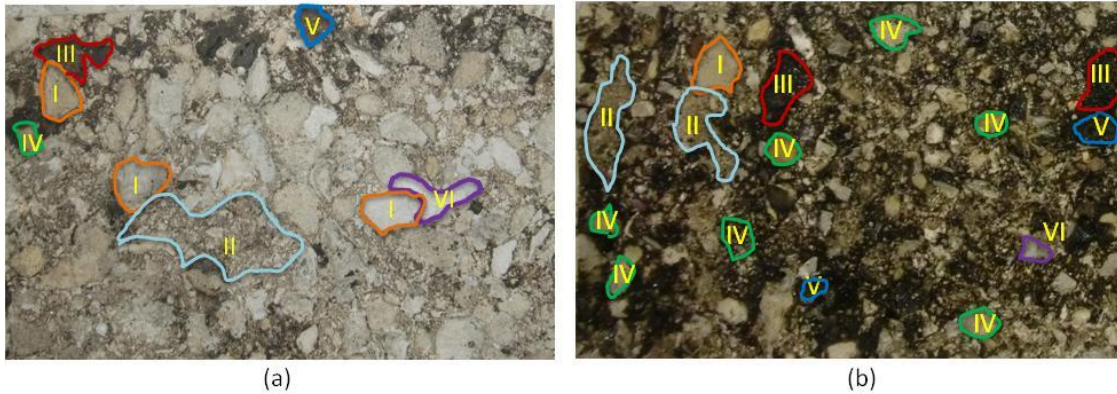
Fractured UTW interface on the concrete side (a) a unmilled specimen and (b) a milled specimen: (I) adhesion failure between concrete and aggregate (II) adhesion failure between concrete and asphalt matrix (III) asphalt failure (IV) aggregate failure (V) aggregate pullout and (VI) voids.
